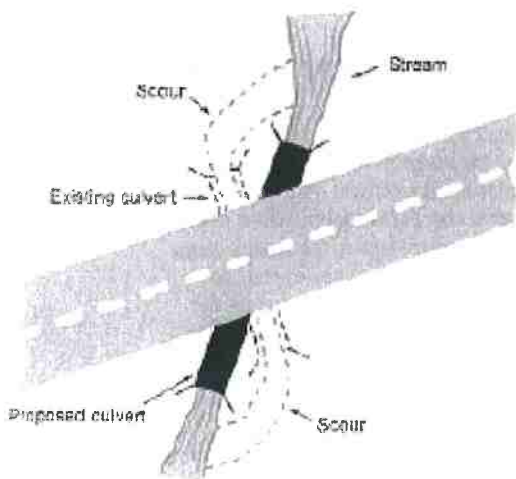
Culvert alignment should be in relation to the stream and not the road. It is important that the stream enters and leaves the culvert in a relatively straight horizontal alignment so streamflow does not have to turn to enter the inlet or discharge into a bank as it exits. This figure shows a redesigned culvert installation that replaces the bending alignment that previously existed. Channel turns at the inlet increase plugging potential because wood going through the turn will not align with the inlet. Similarly, channel turns at the inlet and outlet are often accompanied by scour against the channel banks (Wisconsin Transportation Information Center, 2004).
